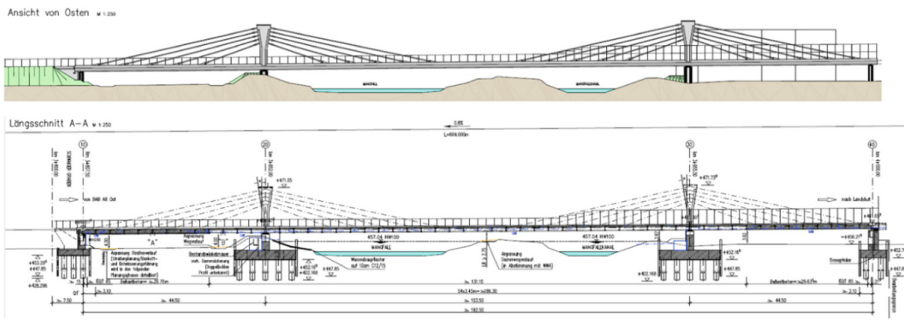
Bridge Segment 1: Cable-stayed bridge over the Mangfall river and Mangfall canals (side view); Ingenieurbüro Grassl GmbH (Structural design) | Reinhart + Partner Architekten und Stadtplaner (Visualisation).
